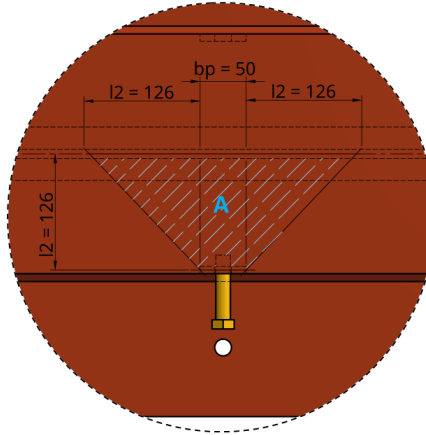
Cropped top view of the integrated beam with mobilised area for flange bending (A), all dimensions in millimetres
